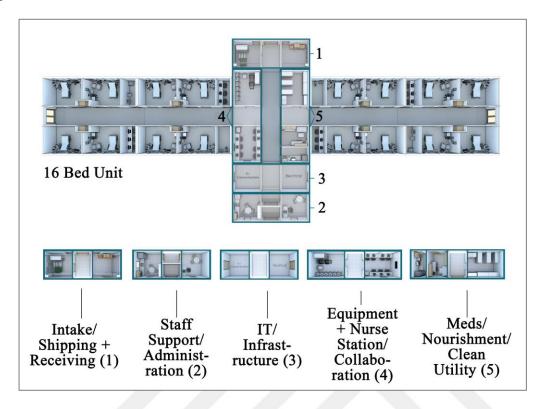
STAAT Mod Units Layout Design (HGA, n.d.) (Redrawn from info)
